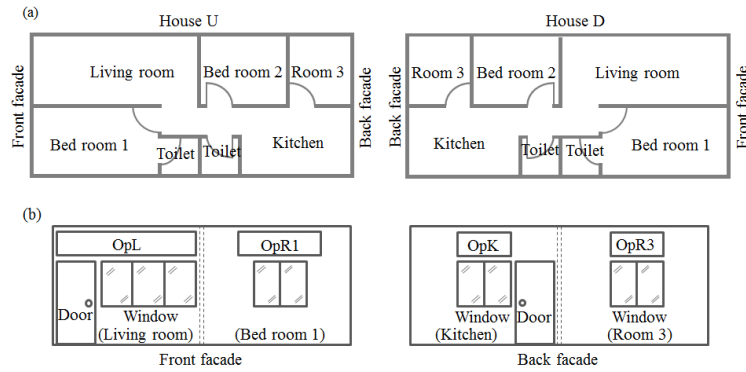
(a) Room layouts and (b) elevation views of front and back facades of the upwind and downwind houses
